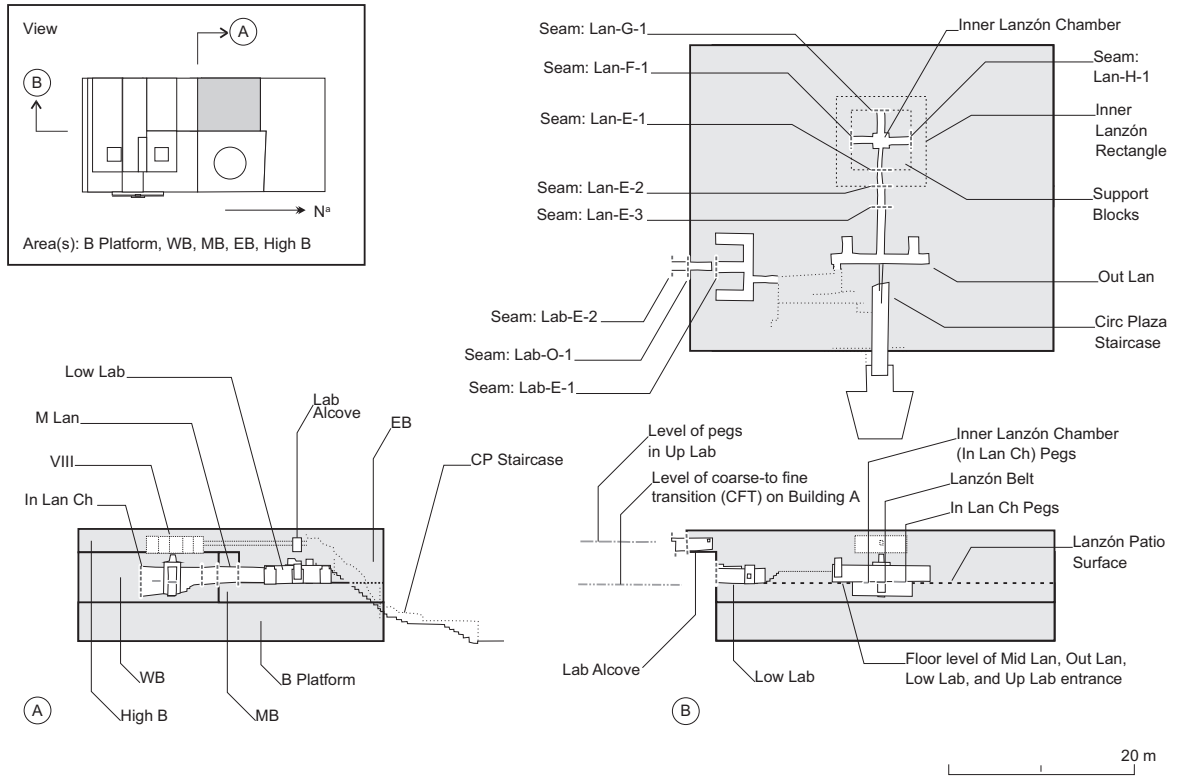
Building B: spatial relationships of internal and external architecture; plan and architectural north (A) and west (B) profile views. Circular Plaza Staircase is not shown in view (B). Gallery VIII is not shown in plan view.
